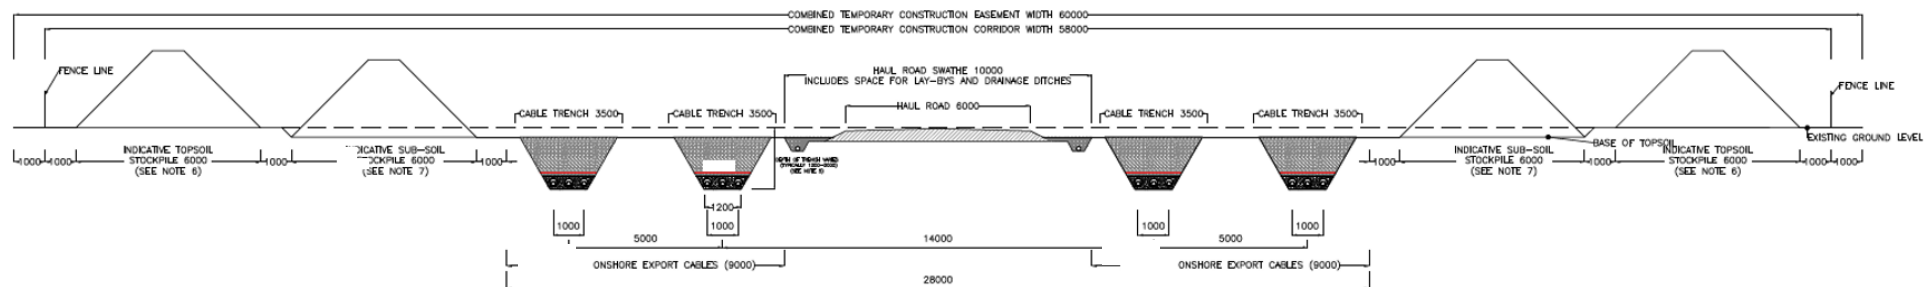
Typical construction swathe cross-section for open cut trenching
